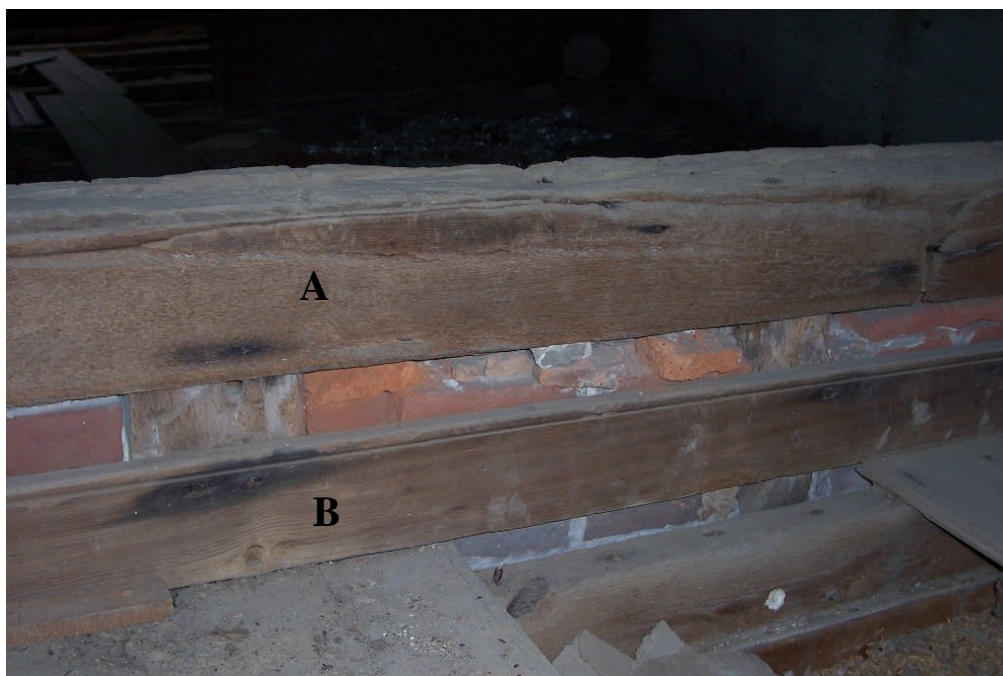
Base of the north wall of Room 202, showing a surviving piece of weatherboard siding (A) used to cover the south end of the original house prior to the construction of the stone addition and (B) the beaded baseboard used in the Room 202.
